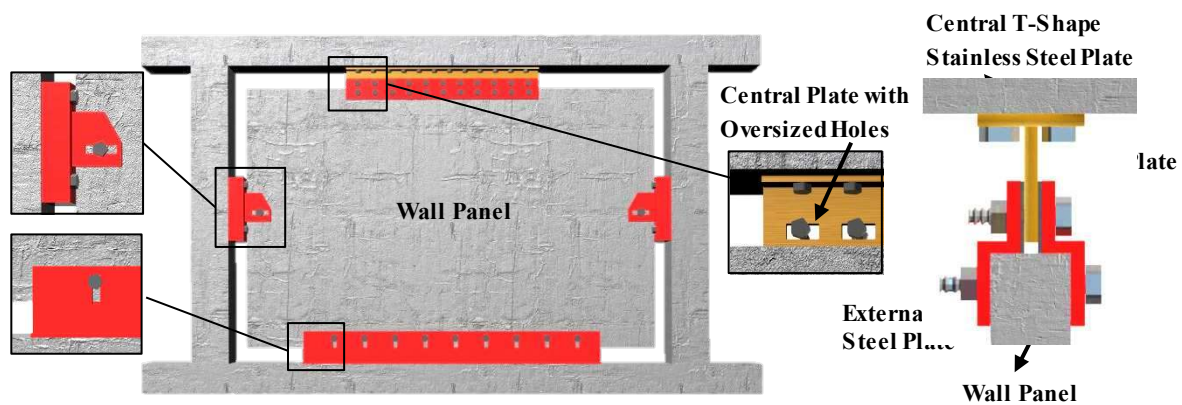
Schematic view of the adopted friction-based wall damper and the utilised slotted bolted connection
